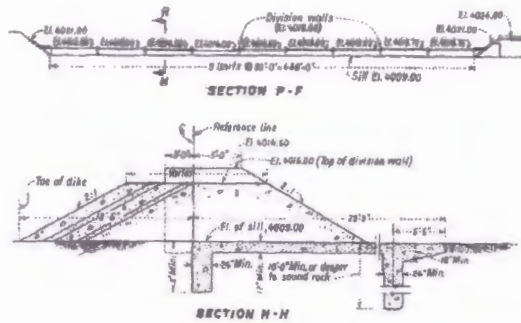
Typical straight drop spillway installation for small bays. 266-D-2999.
